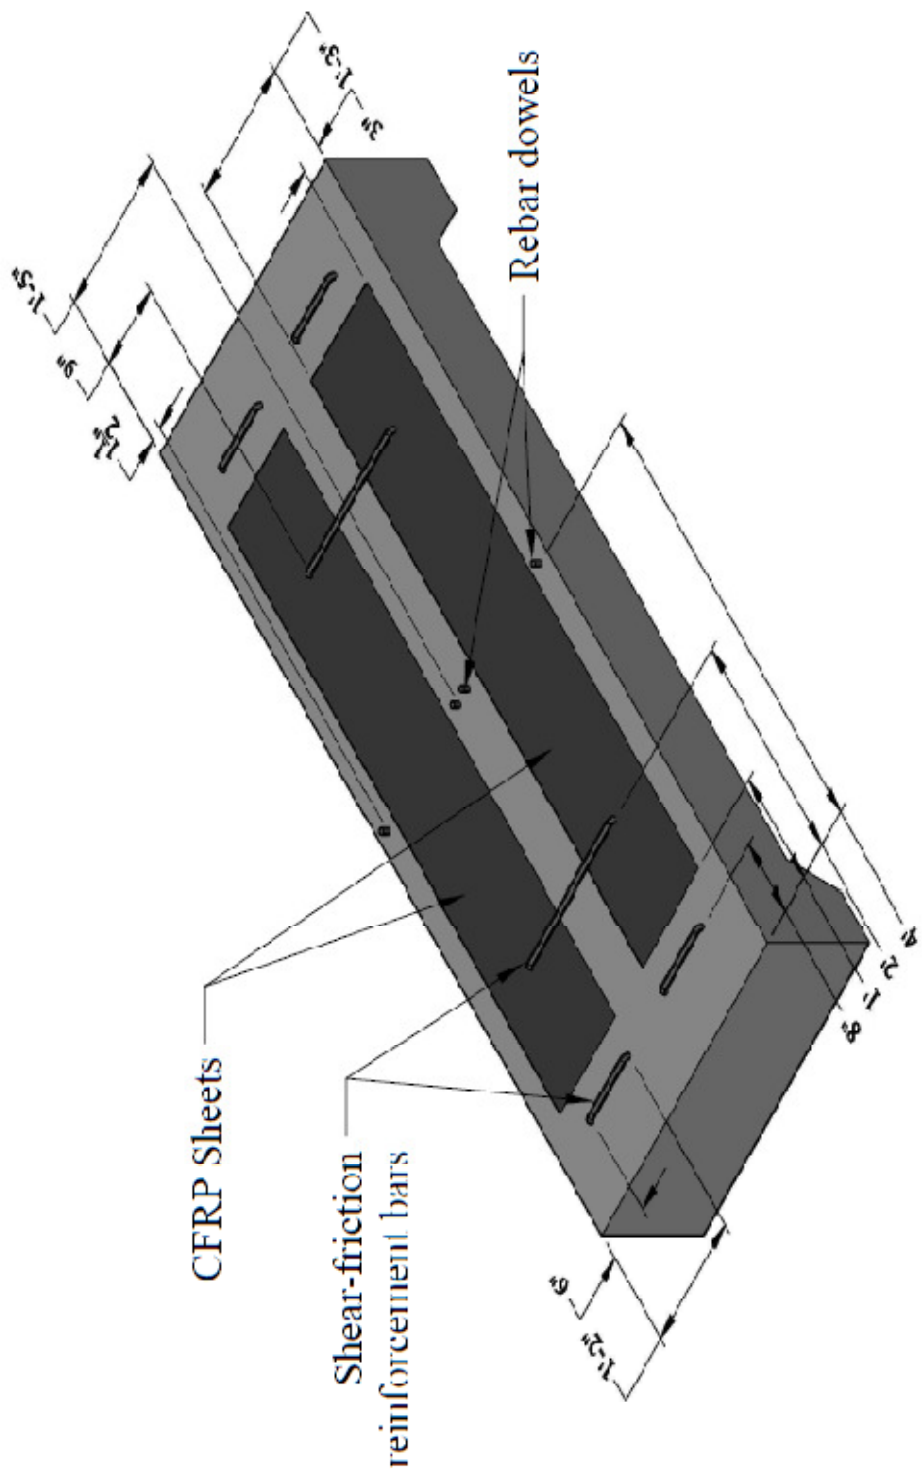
CFRP laminate and shear-friction reinforcement layout and dimensions
